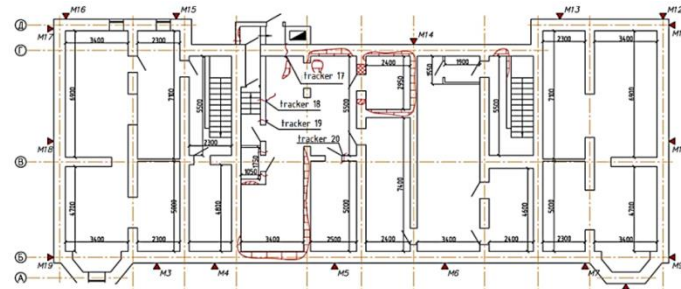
A typical floor plan for a five-story apartment building with a sediment grade scheme 1-25.
